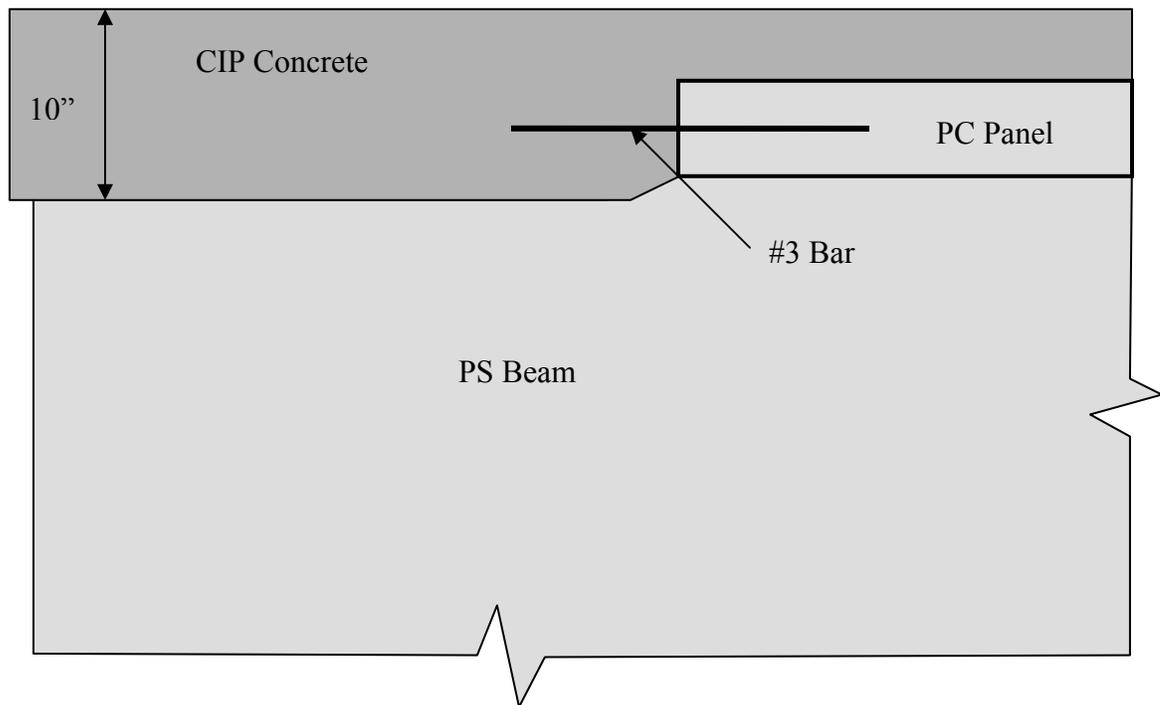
Typical Section at Thickened Slab Diaphragm – Current Details
